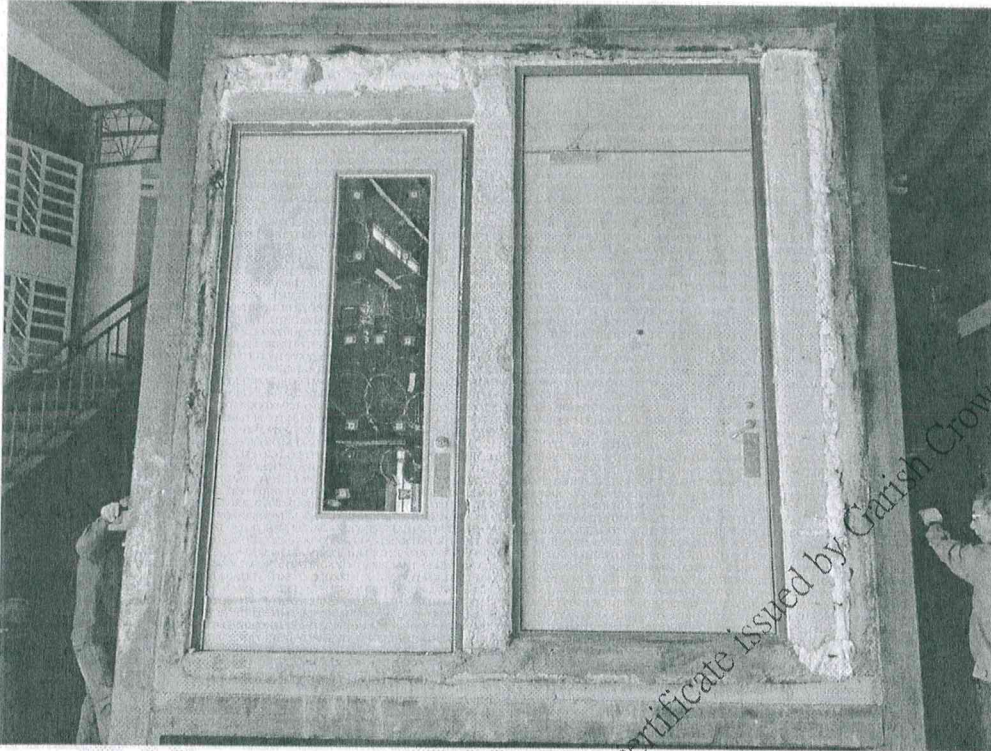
Exposed surface of the specimens before test. (Left: Door B; Right: Door A)
